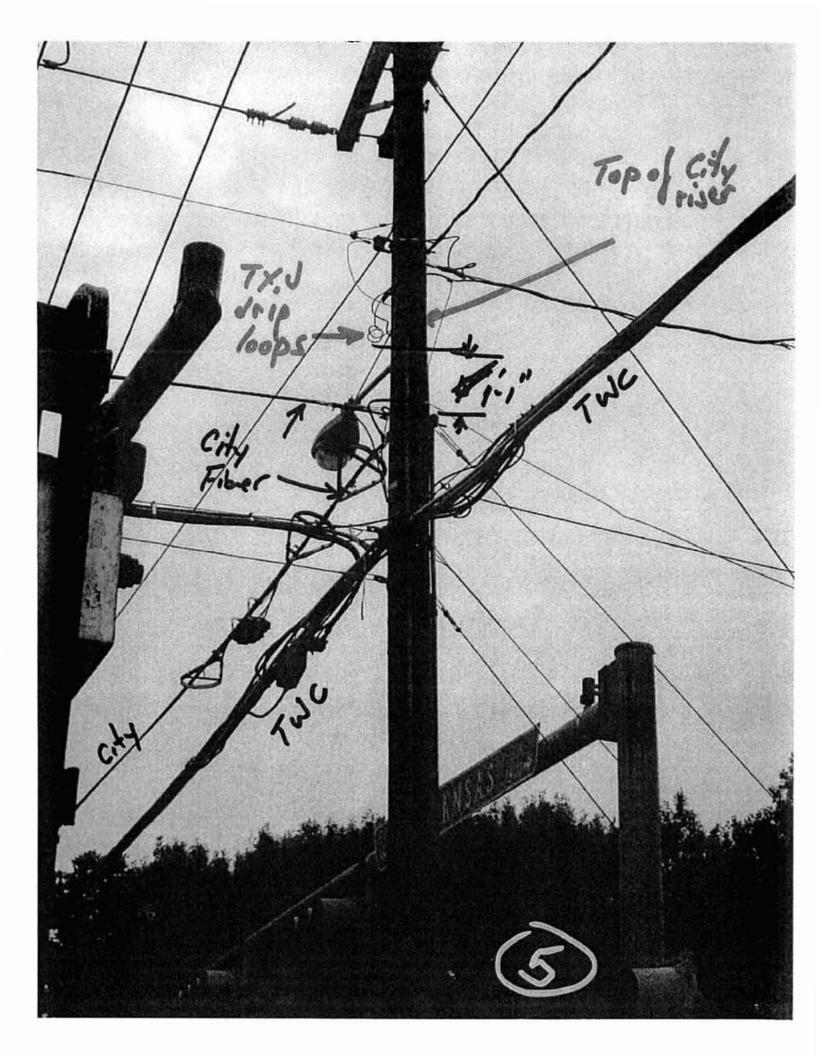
This is excessive slack in transformer leads, new construction, TXU-TWC, TXU caused. See also discussion in Other Observations section of this report, item 3.
